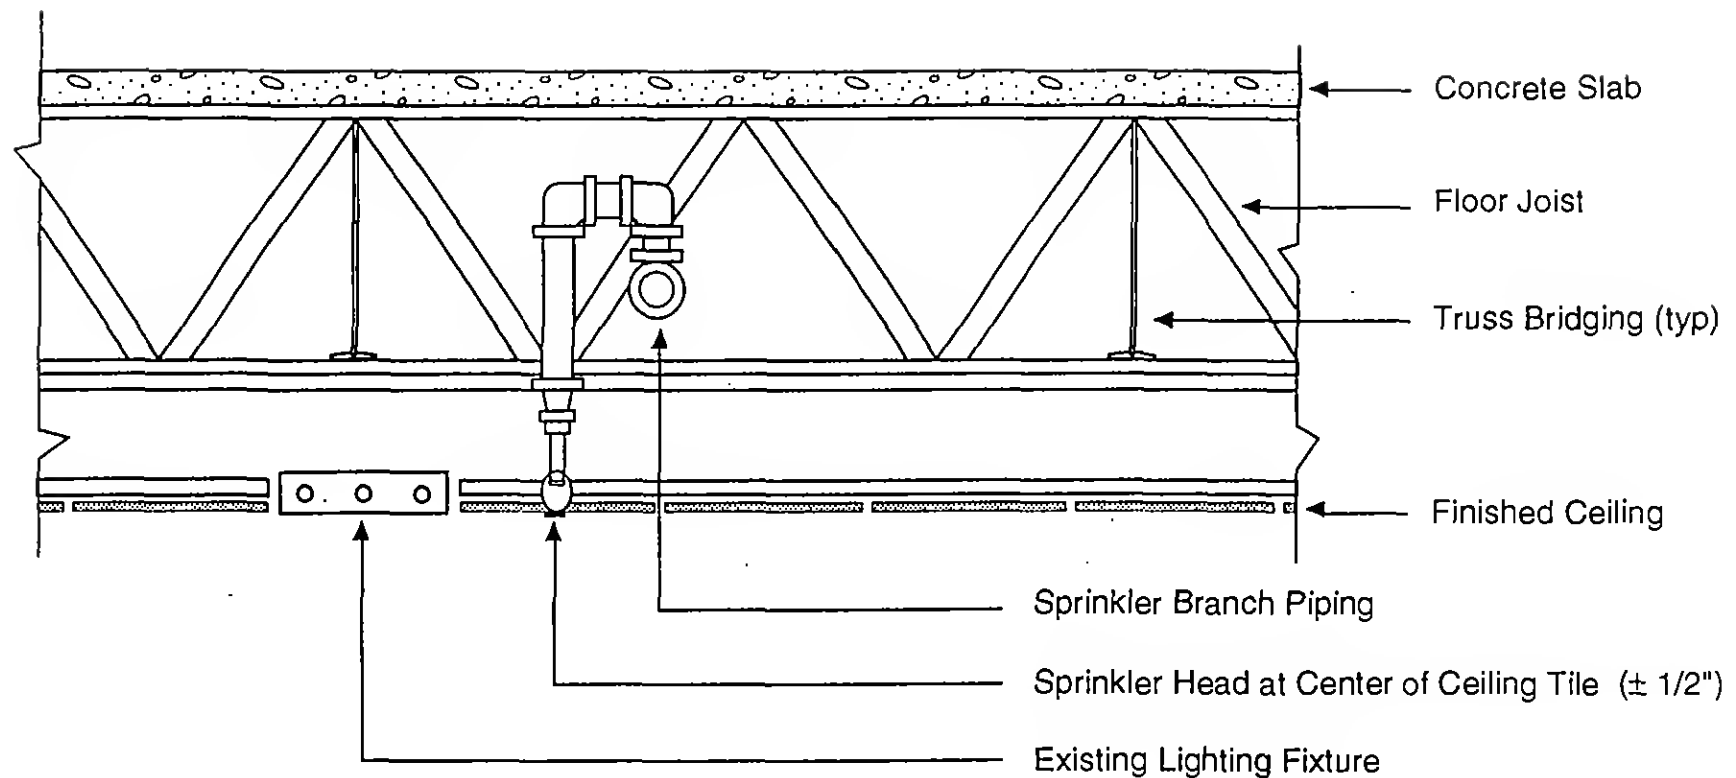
DETAIL OF PIPE LOCATION IN SUSPENDED CEILING
